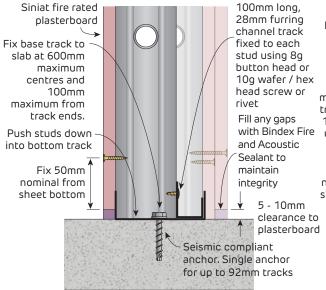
Wall Base - Staggered Stud 64mm Studs in 92mm Base Track Section
